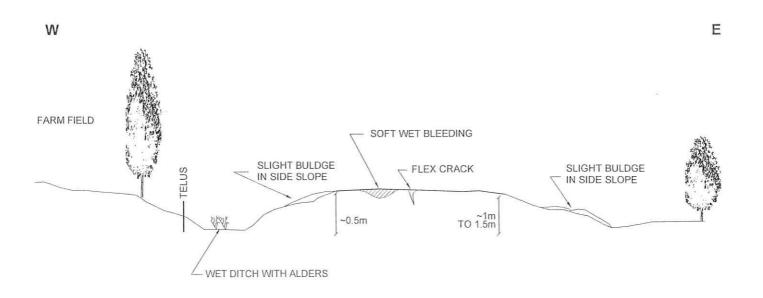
SKETCH SITE PLAN NC61 HWY 777:03
